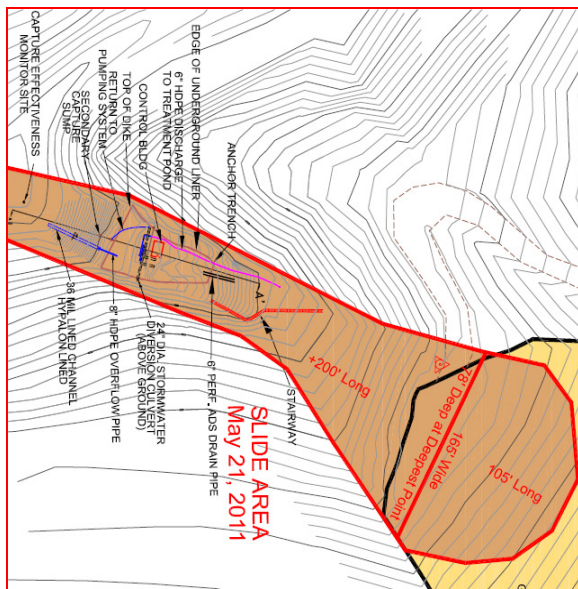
Detail of Carter Gulch failure, showing the specific water collection features destroyed or damaged.
